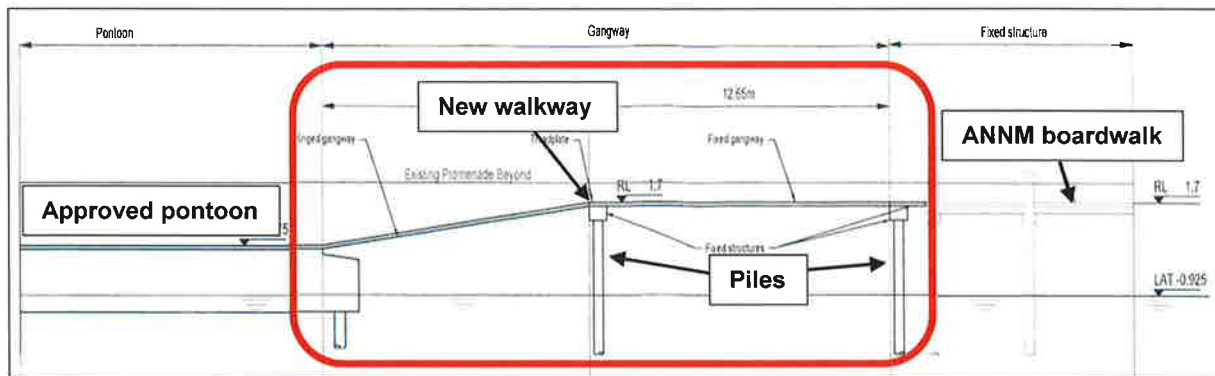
Section of proposed walkway (Source: Applicant's EIS).
